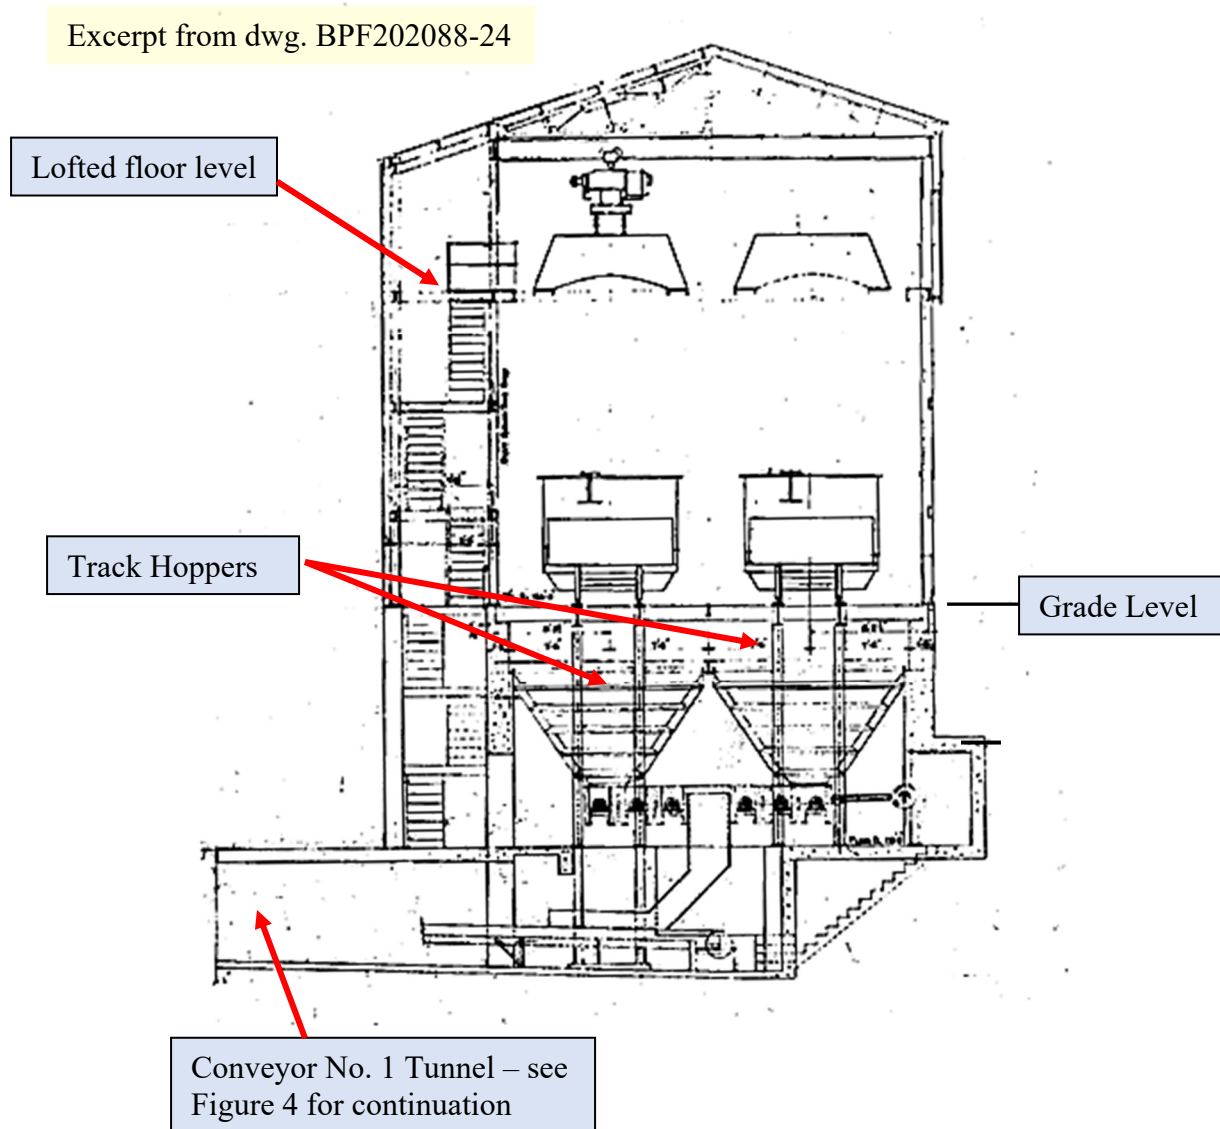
Coal Handling Shaker House (484-24D) and Track Hoppers
